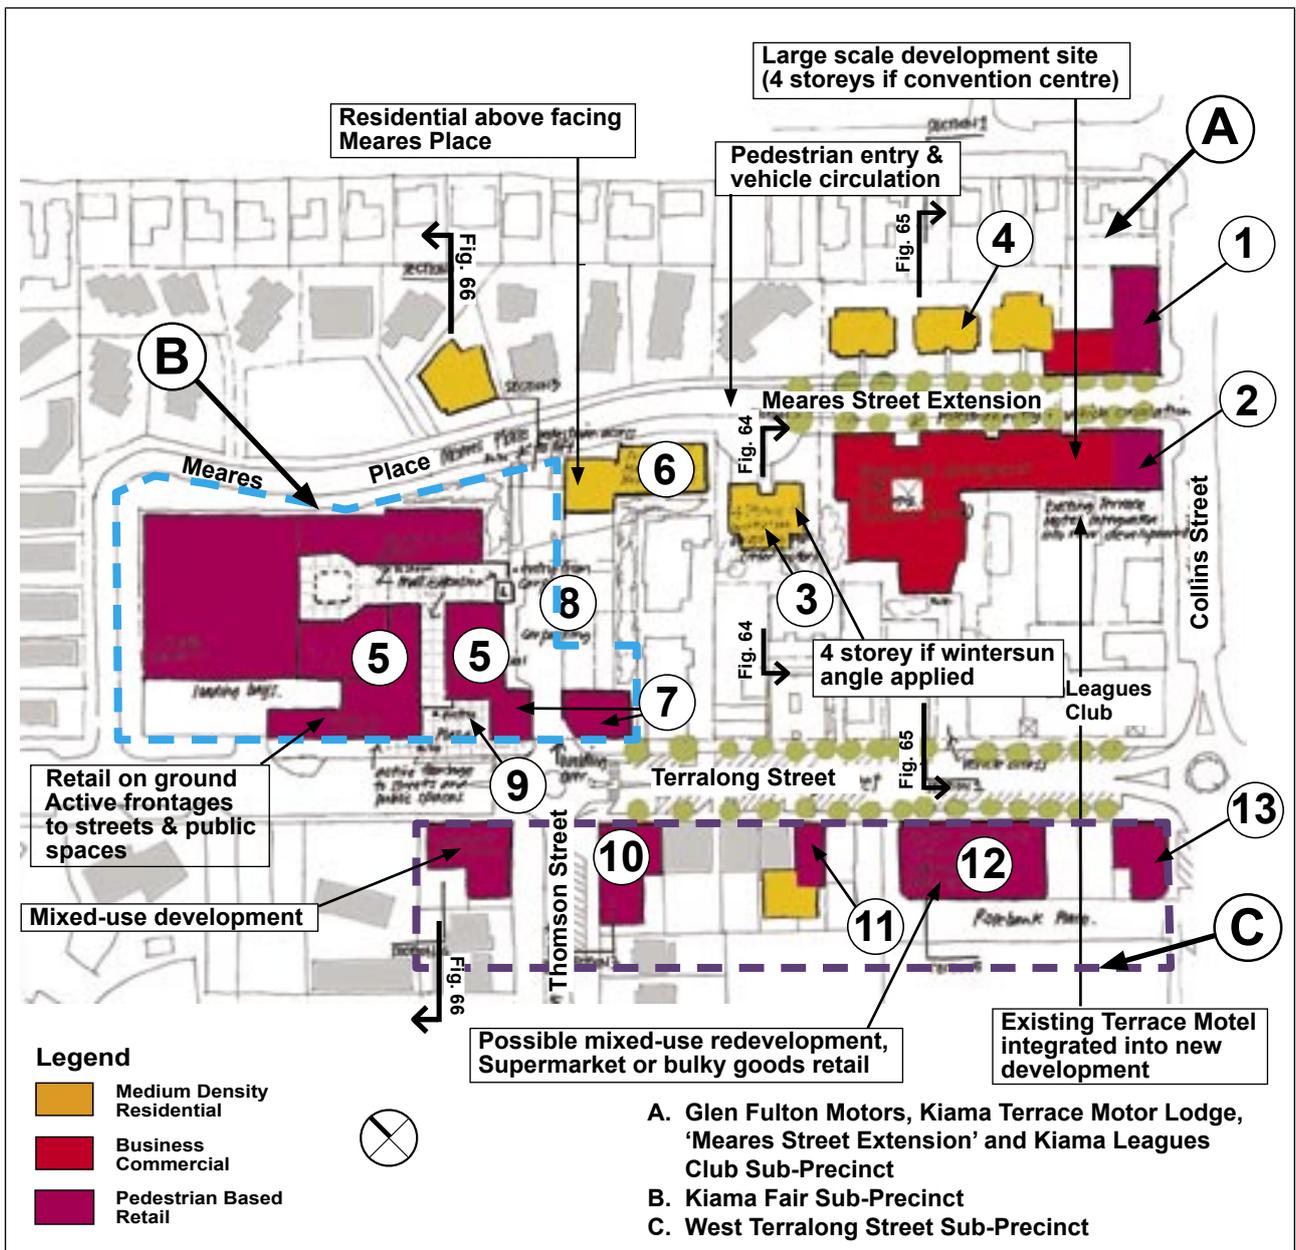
The Indicative Plan above shows the entire Western Precinct; the accompanying text refers to the lettered keynotes shown on this plan. Additional indicative sections through the site and perspective sketches follow (see Figures 62-66), which further illustrate proposals for this precinct.
